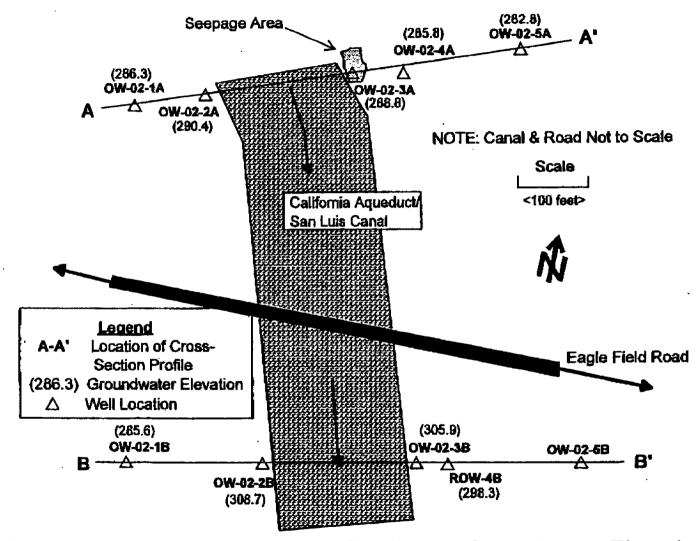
Eagle Field Road - Location of Wells and Groundwater Elevations
